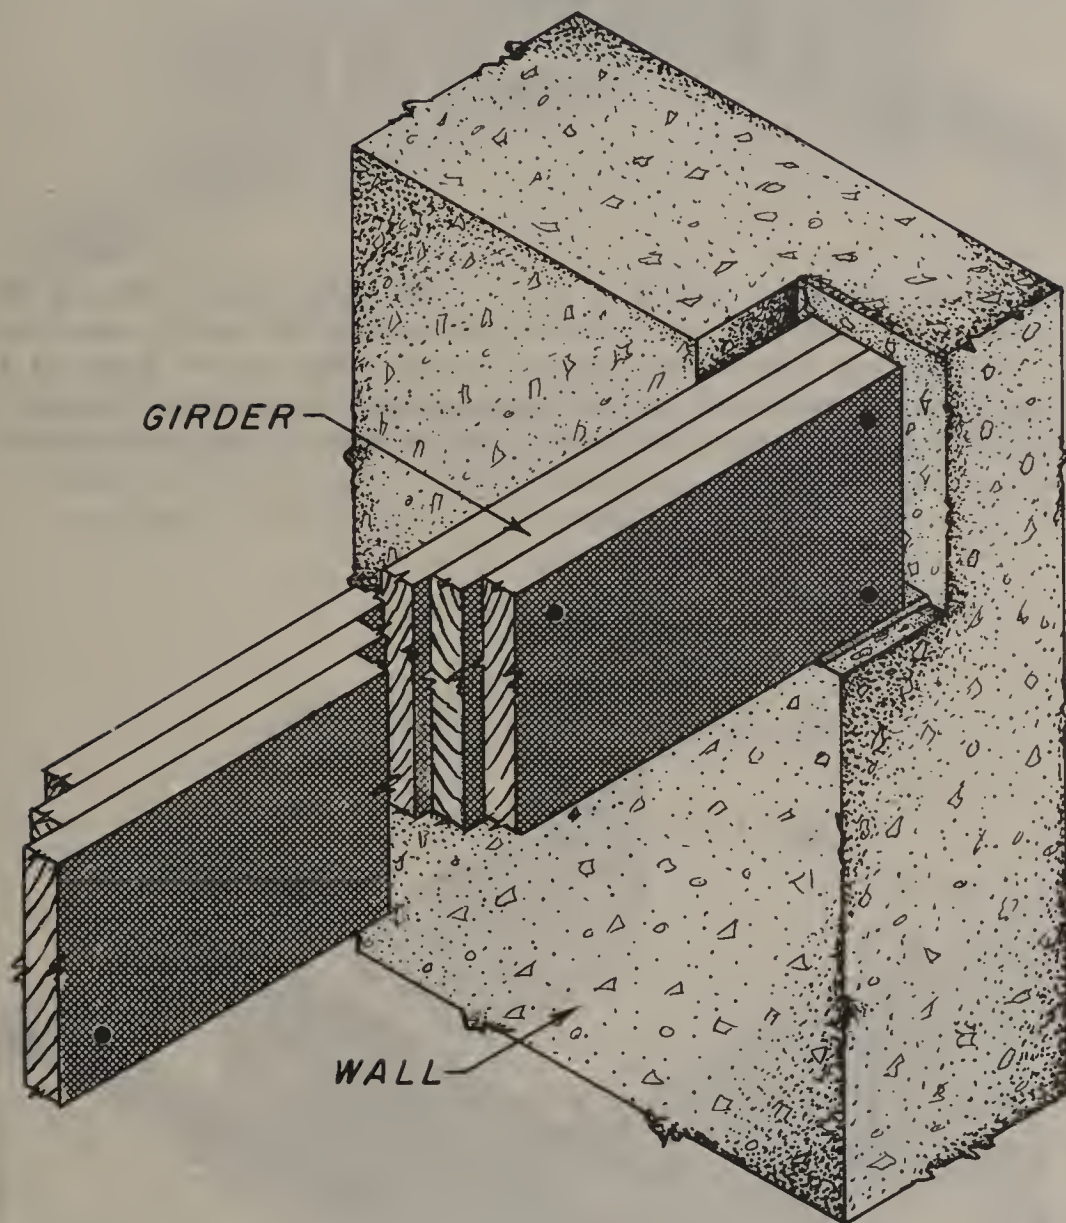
Three-piece girder. Nailed from each side with twenty-penny nails, two near each end of each piece, others staggered with a horizontal distance of 32 inches between nails. Girder joints should occur only at supports. Note: Where a four-piece girder is used, the additional part is nailed to the three-piece girder with twenty-penny nails, two near each end of each piece, others staggered with a horizontal distance of 32 inches between nails.
